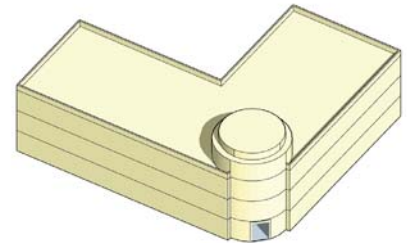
Basic massing, articulation, and opening strategies should relate to each other and break down the scale of the buildings.
